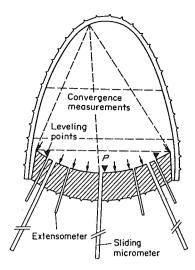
Example of a cross section in the test gallery with an anchored floor plate and the layout for field observations (Freudenstein Tunnel)
